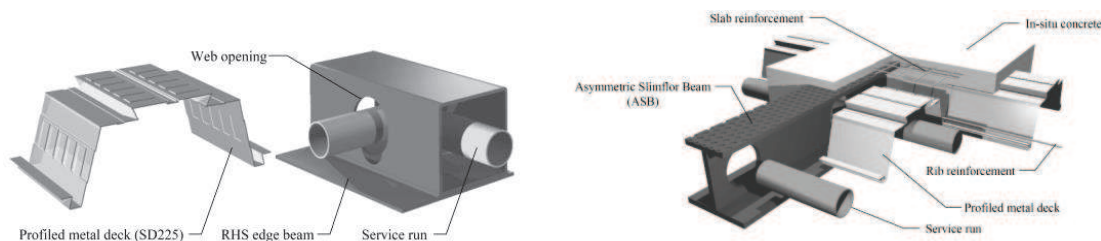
Examples of beams with web penetrations – Slimfloor System (Ridley-Ellis 2000) – using either (a) Hollow Sections or (b) I sections
